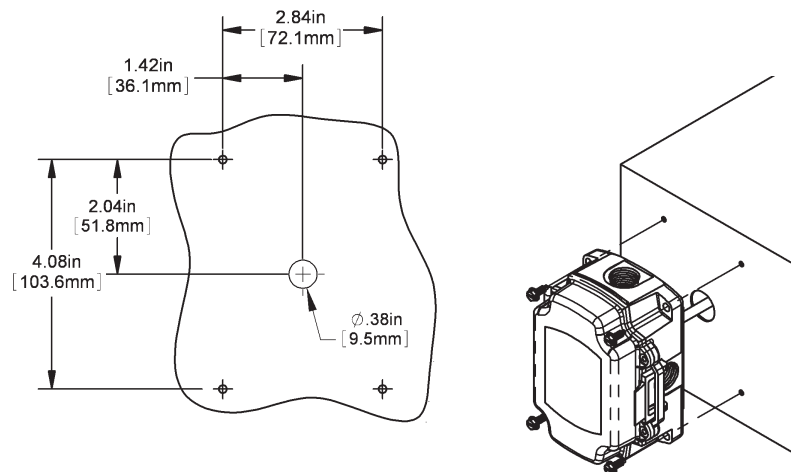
BAPI-Box (BB) Enclosure Mounting Holes, Rotate 90° for Horizontal Mounting
